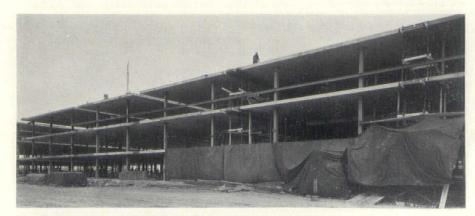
One wing of lifted slab. Some of the connecting strips are still incomplete but others have been shored up and concreted. Mechanical ductwork has already begun to be located in interior of building. Eight inch steel girt beam can be seen at third floor level
